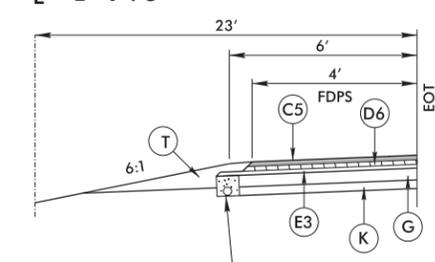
DETAIL SHOWING GEOTEXTILE FOR PAVEMENT STABILIZATION
